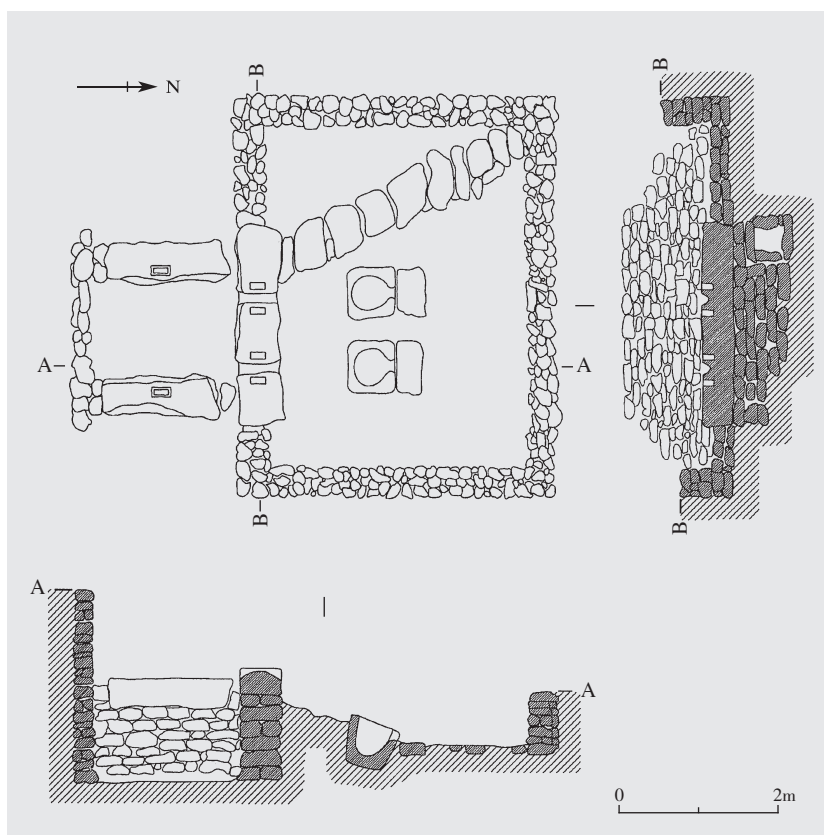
The plan and section of trip hammer 2 at Zhouling Village.
